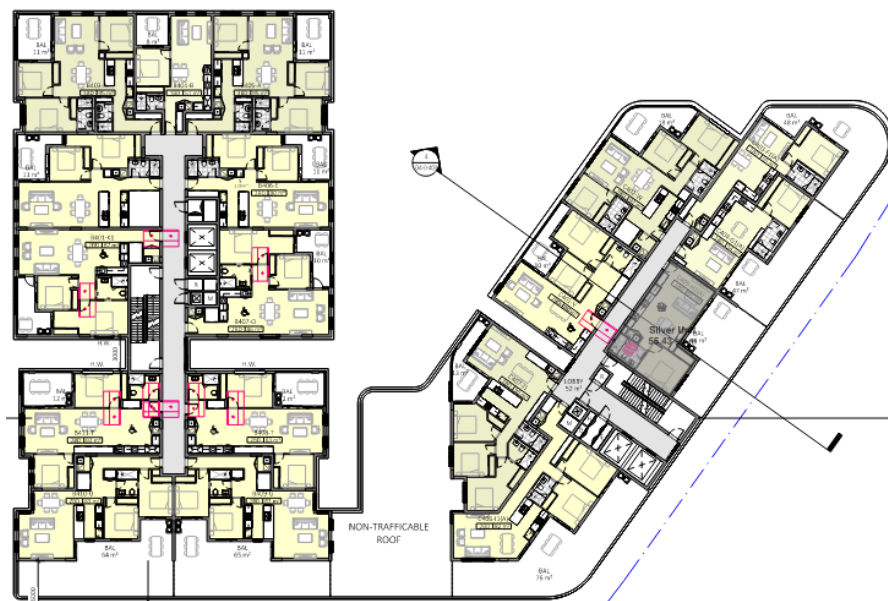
Fourth to Fifth Floor Livable Unit Location(s) on Architectural Plans
